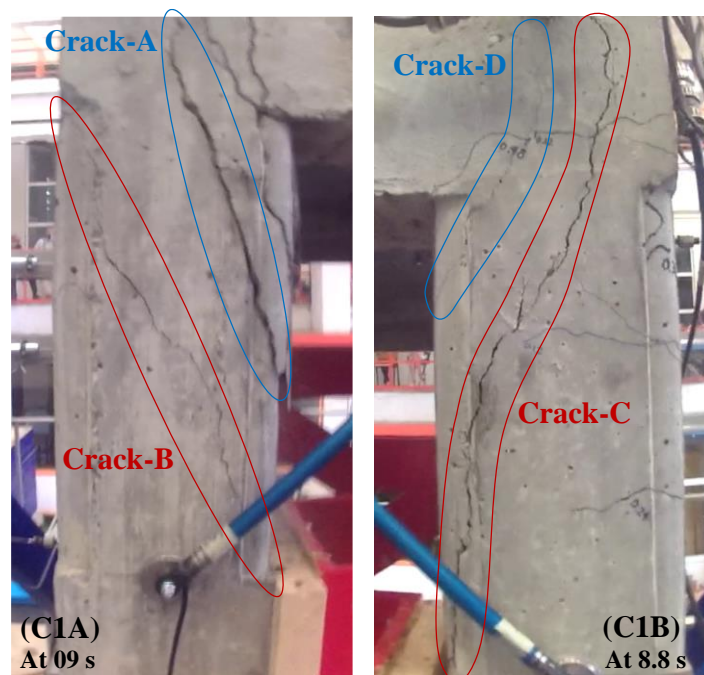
Crack development in the short columns C1A and C1B during the 1.60g PGA test (CC-EQ building)
